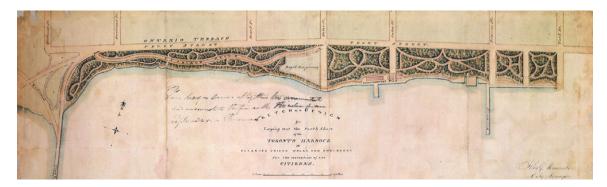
Plan For Waterfront, Howard [1852] shows John Howard's "Sketch of a Design for Laying Out the North Shore of the Toronto Harbour in Pleasure Drives Walks and Shrubbery for the Recreation of the Citizens". The plan illustrates the notion of placing certain key institutions within the linear park, as has been suggested in The City's Part II Plan. This plan also shows the railways from the west terminating at Bathurst Street.
